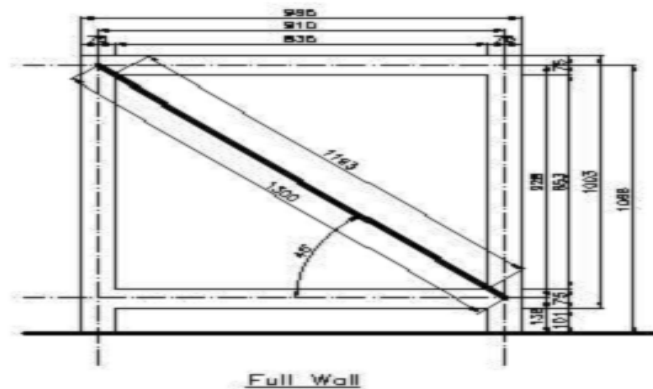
Geometry of test spacemen [Sumat Shrestha (2005)]³¹
